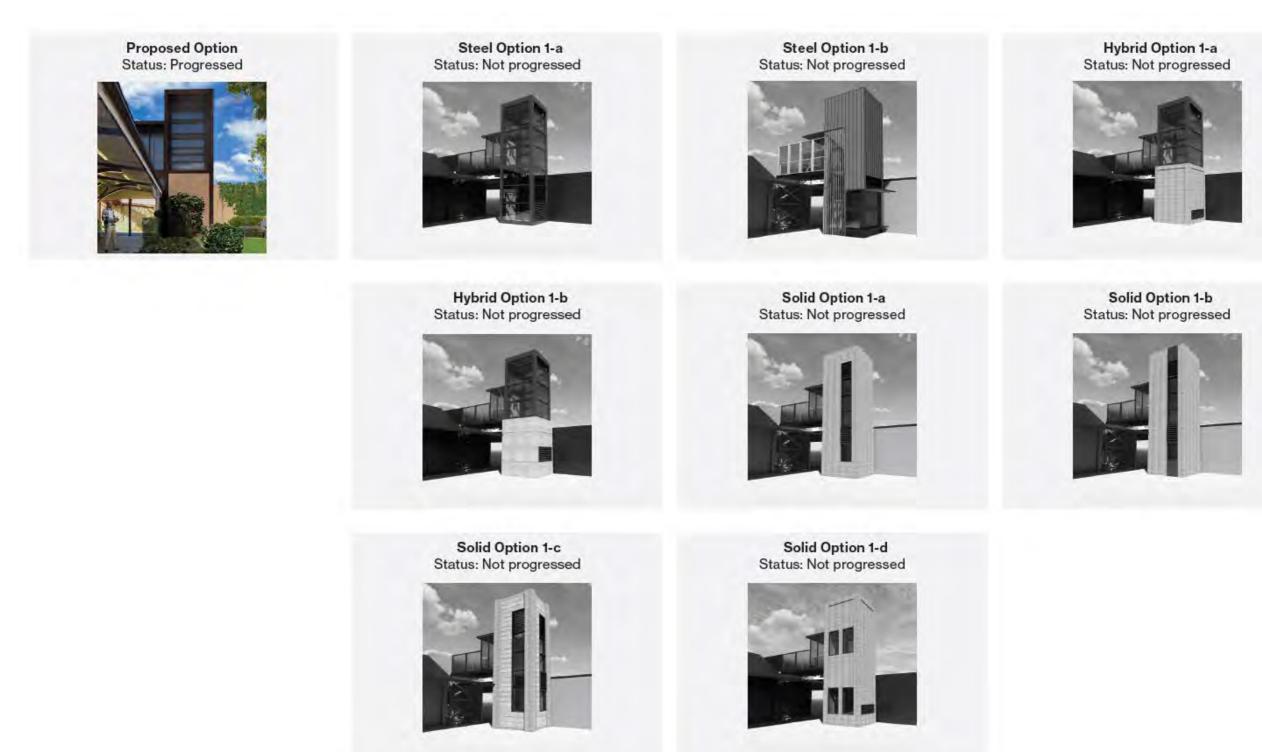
Design optioneering for materiality, colour and detailing of the proposed lifts along the Argyle Street footbridge. (Source: Architectus, August 2023)
